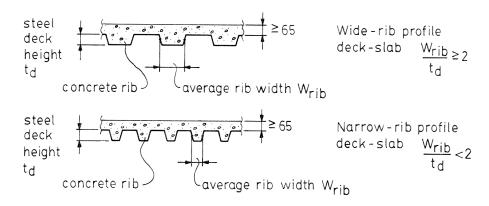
Concrete Ribbed Slab Formed by Steel Decks
